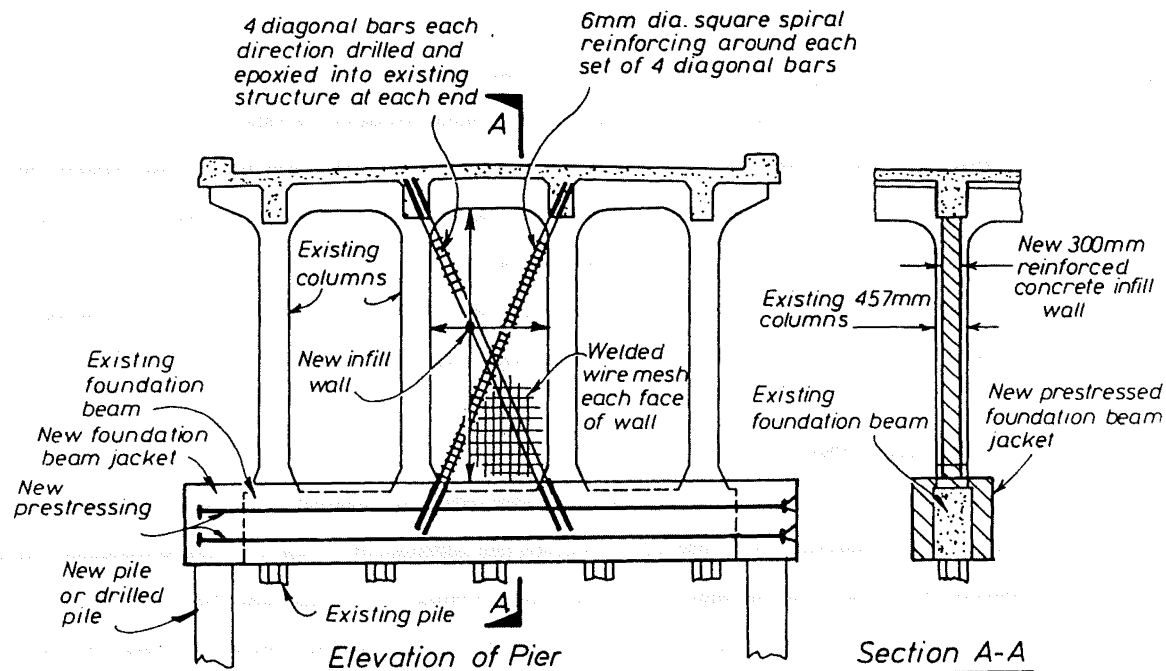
Possible seismic strengthening using a reinforced-concrete infill wall and foundation strengthening.
